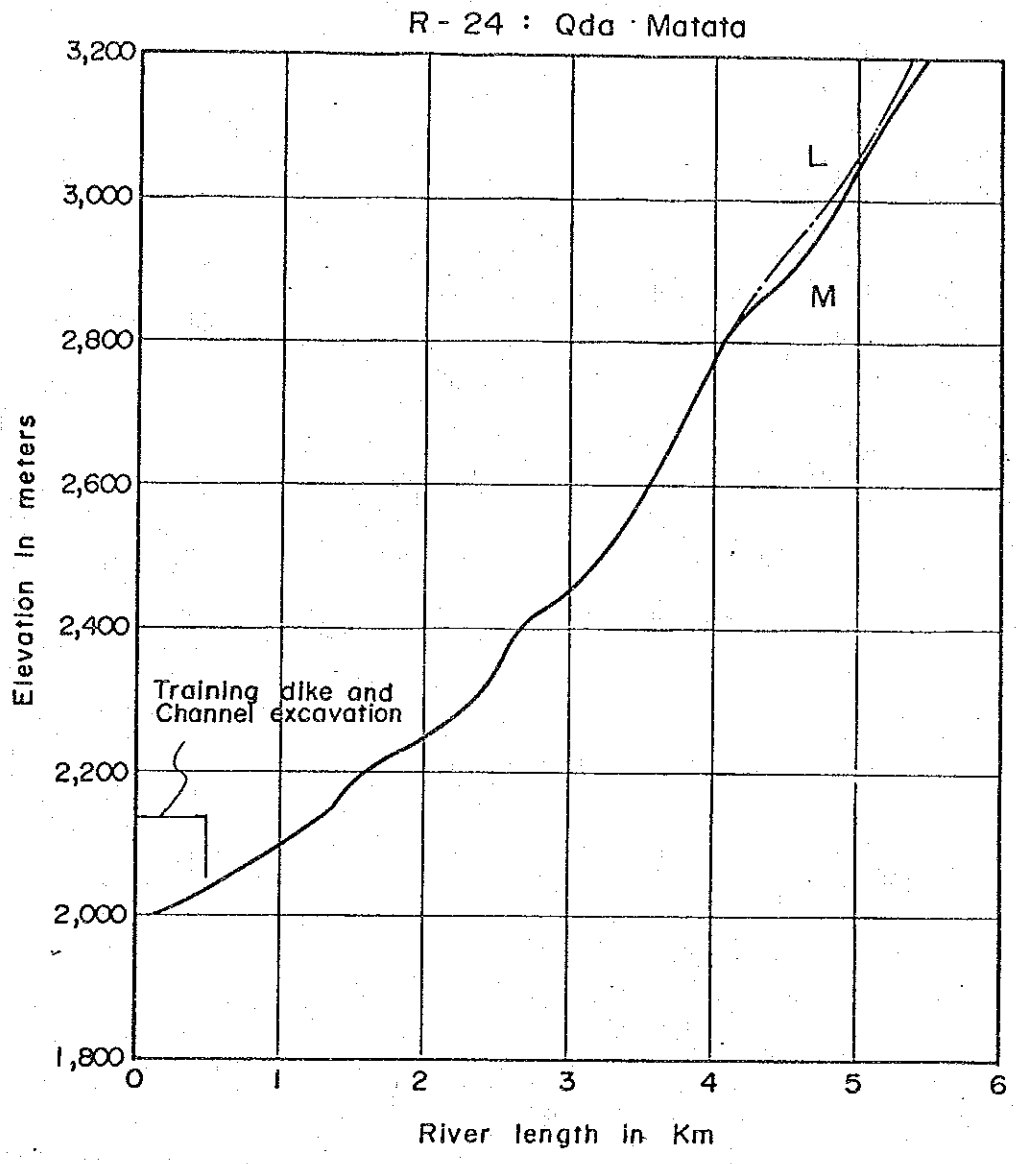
Structural Plan on Profile of Qda Matata (R24)
